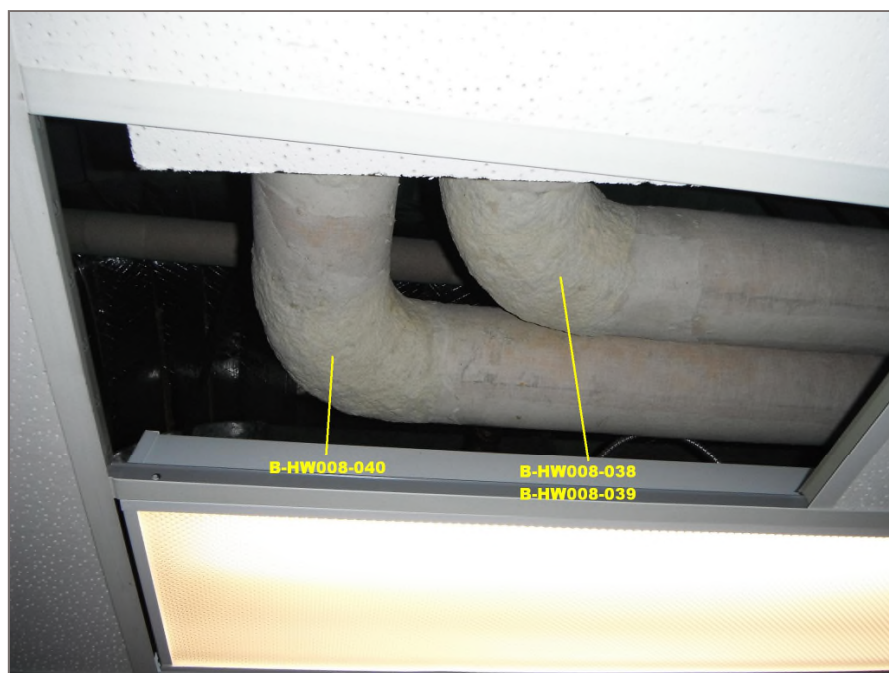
Asbestos-containing mudded pipe insulation applied to the elbow of a 4" diameter pipe within the basement hallway ceiling space. Tetra Tech sample B-HW008-038/-040.
